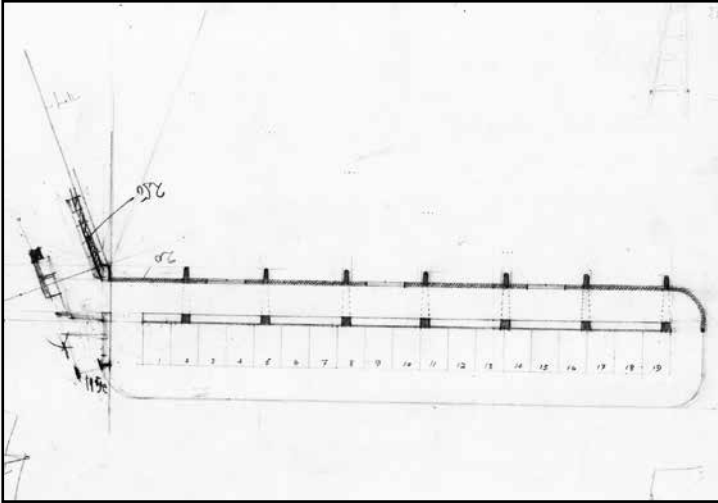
The floor plan of the sundeck wing from 1930 before the finalisation of the design. The load-bearing column row inside the sundeck was square shaped, and paired with another column in the closed rear wall – the architect was apparently developing a ladder structure balanced between two lines. Drawing No. 50-661. The drawing has been edited AAM.
